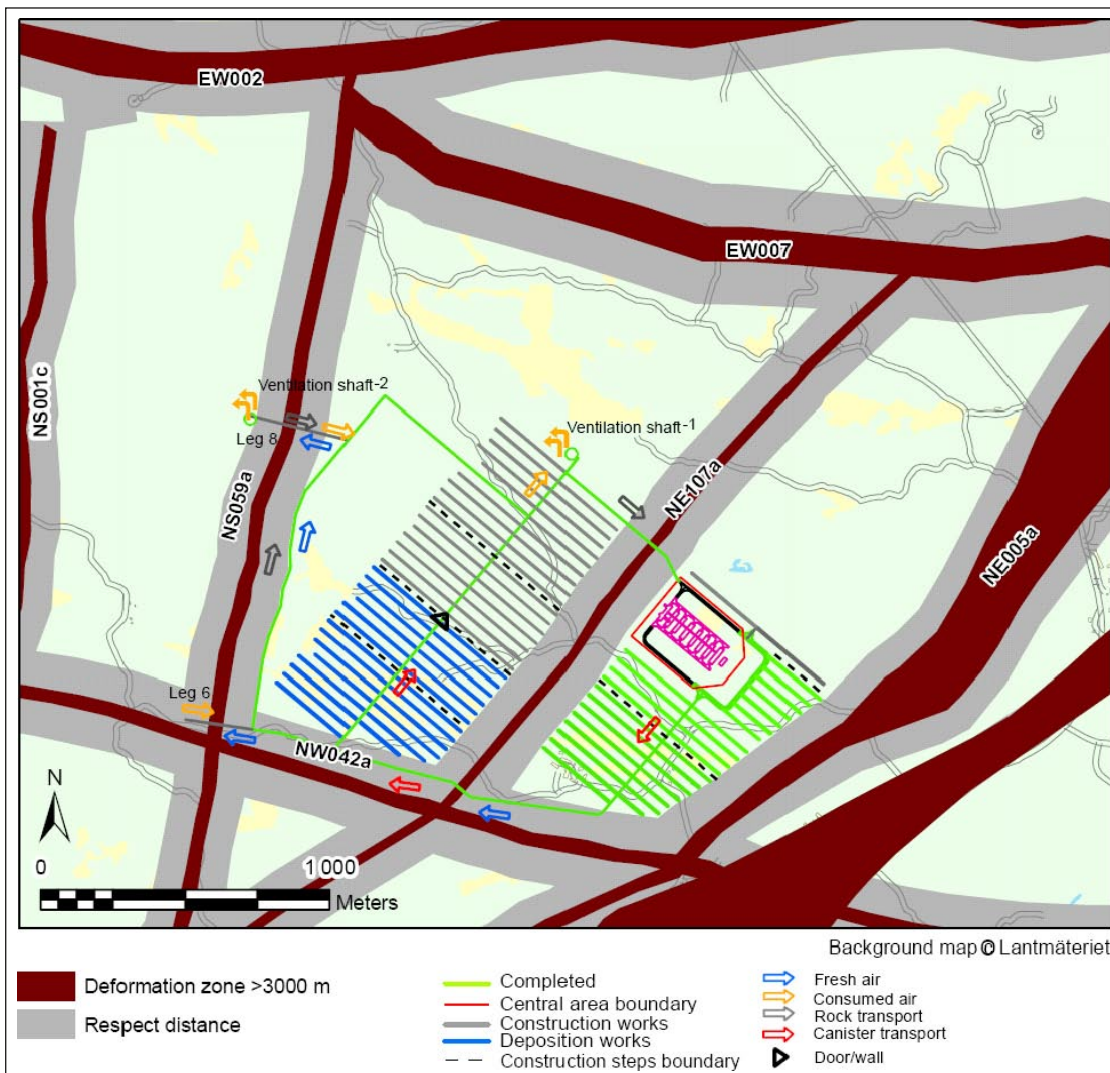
Deposition works in construction steps 3 and 4 and excavation works in construction steps 5 and 6.
